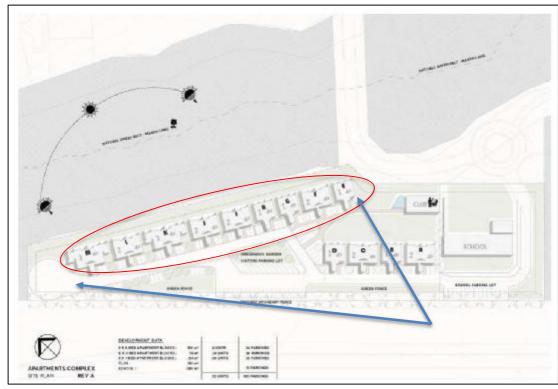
Corresponding plan of the area proposed for development adjacent the N2 Highway with the building in the above 3D model outlined.
